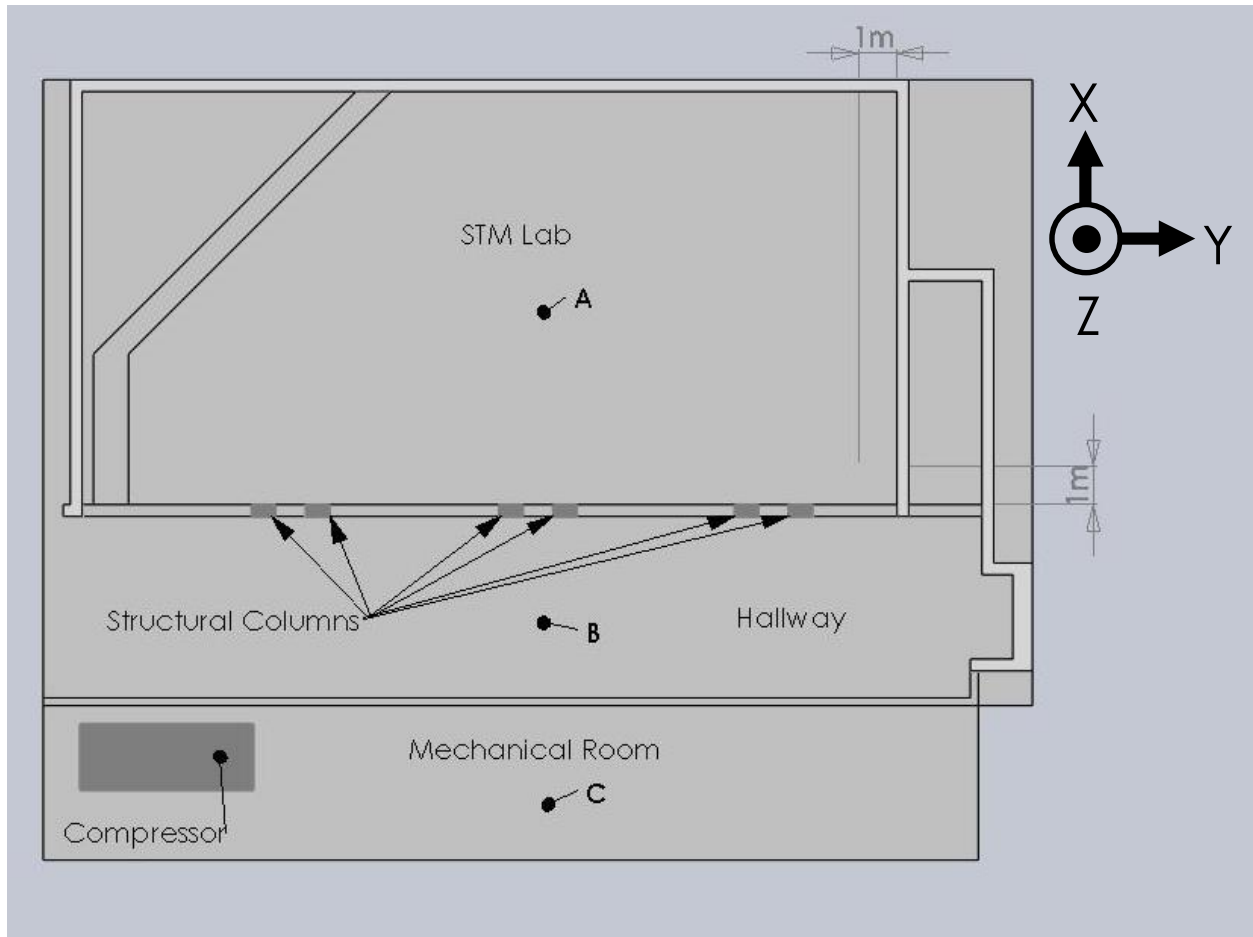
Simplified plan view of the AMPEL basement prior to the construction of the LAIR facility.
